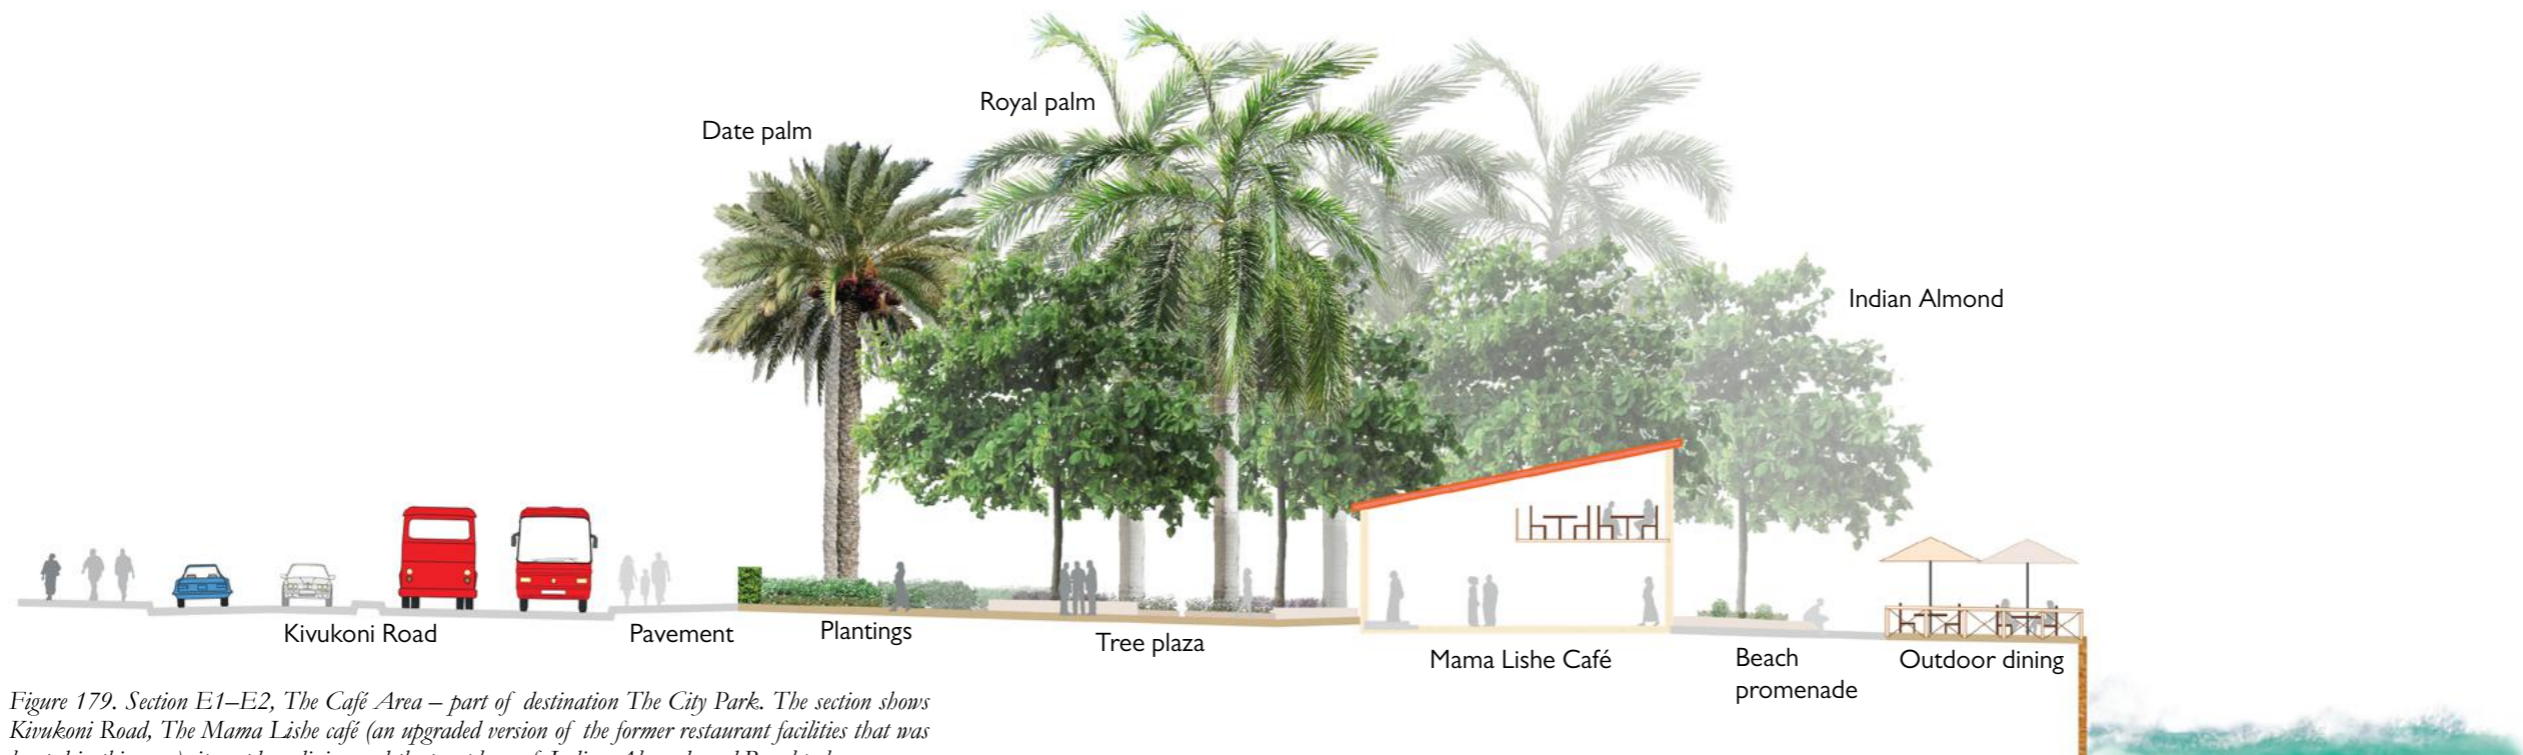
Section E1–E2, The Café Area – part of destination The City Park. The section shows Kivukoni Road, The Mama Lishe café (an upgraded version of the former restaurant facilities that was located in this area), its outdoor dining and the tree plaza of Indian Almonds and Royal palms. Scale 1:250/A3.
